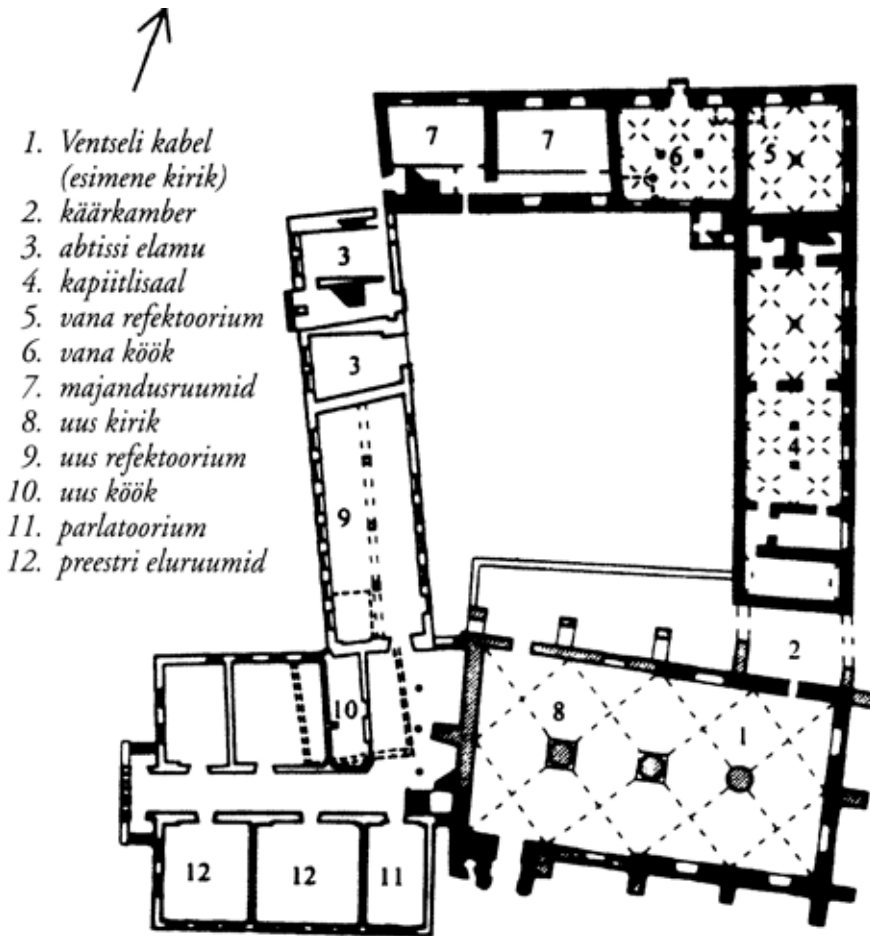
Ground plan of St Michael's convent. Plan by Tõnu Parmakson.
